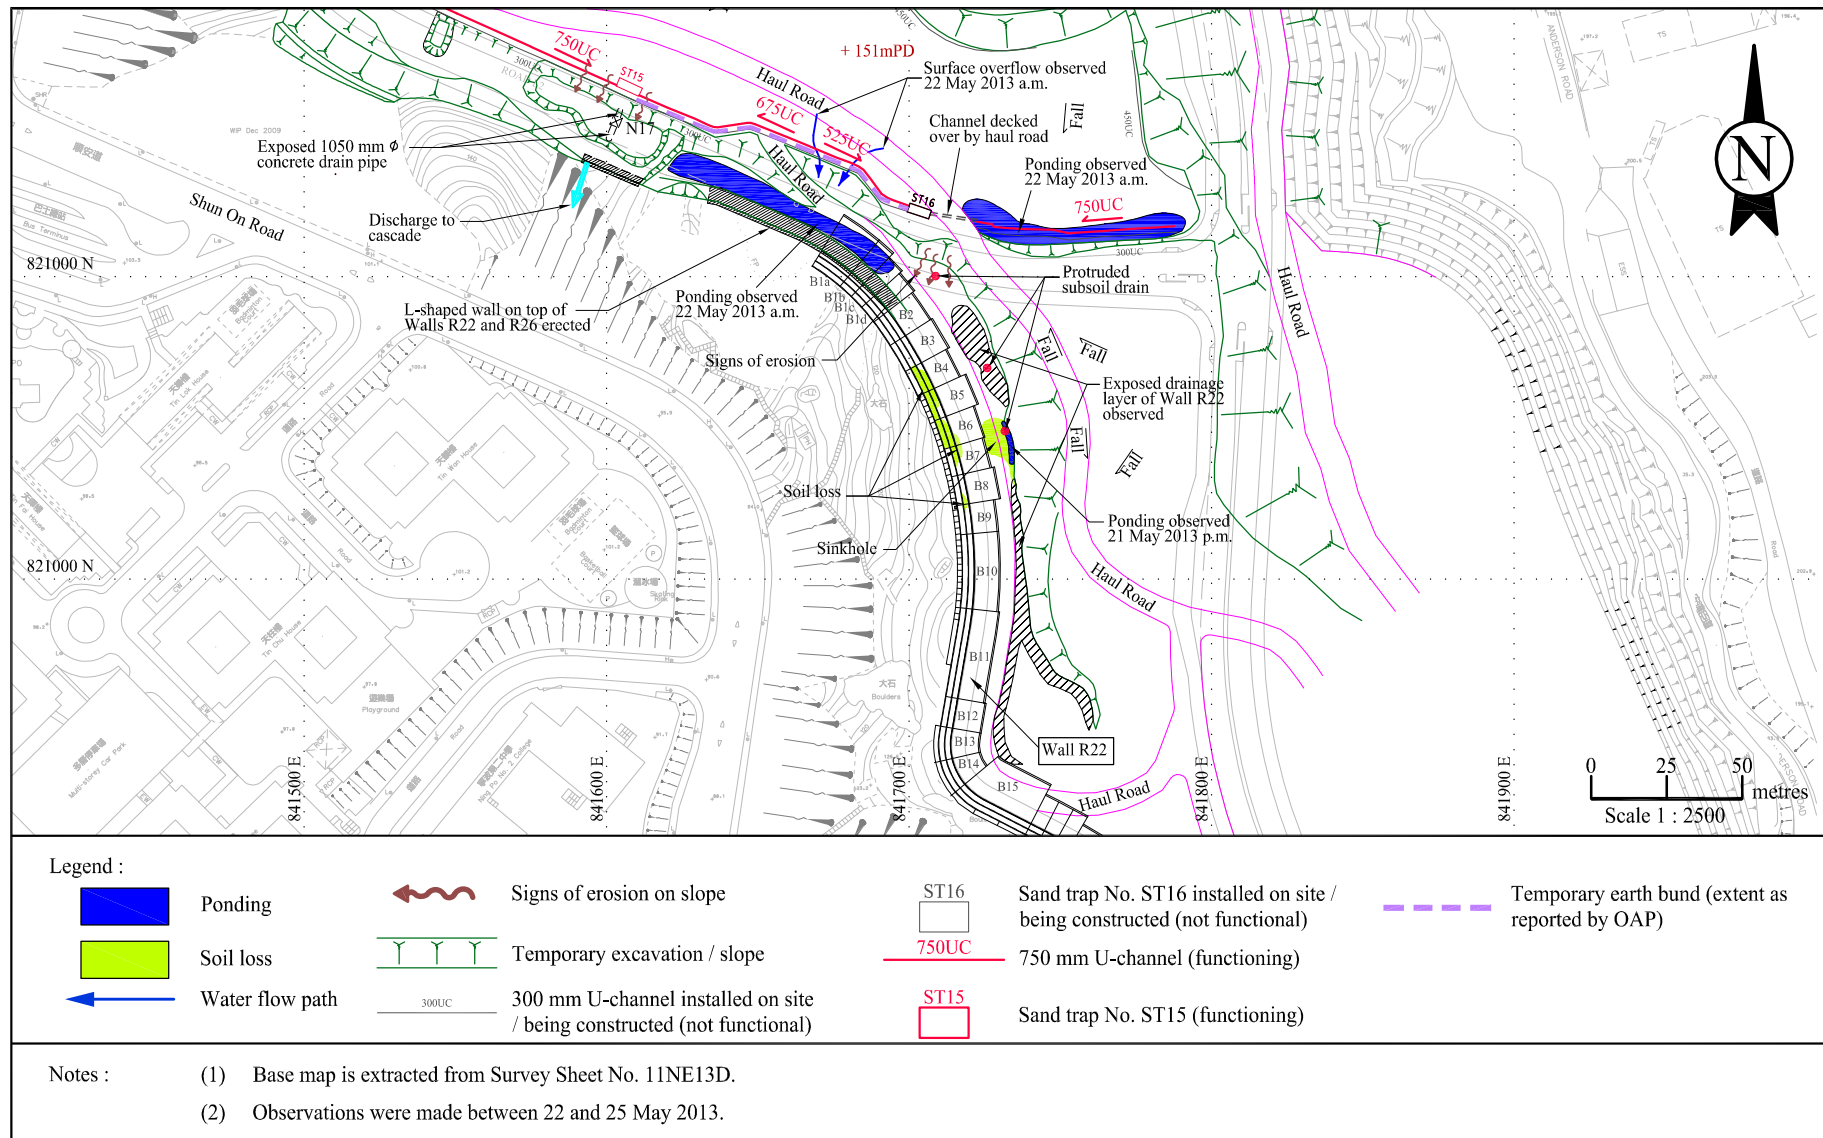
Field Observations on Surface Drainage Provisions in the Vicinity of Wall R22
